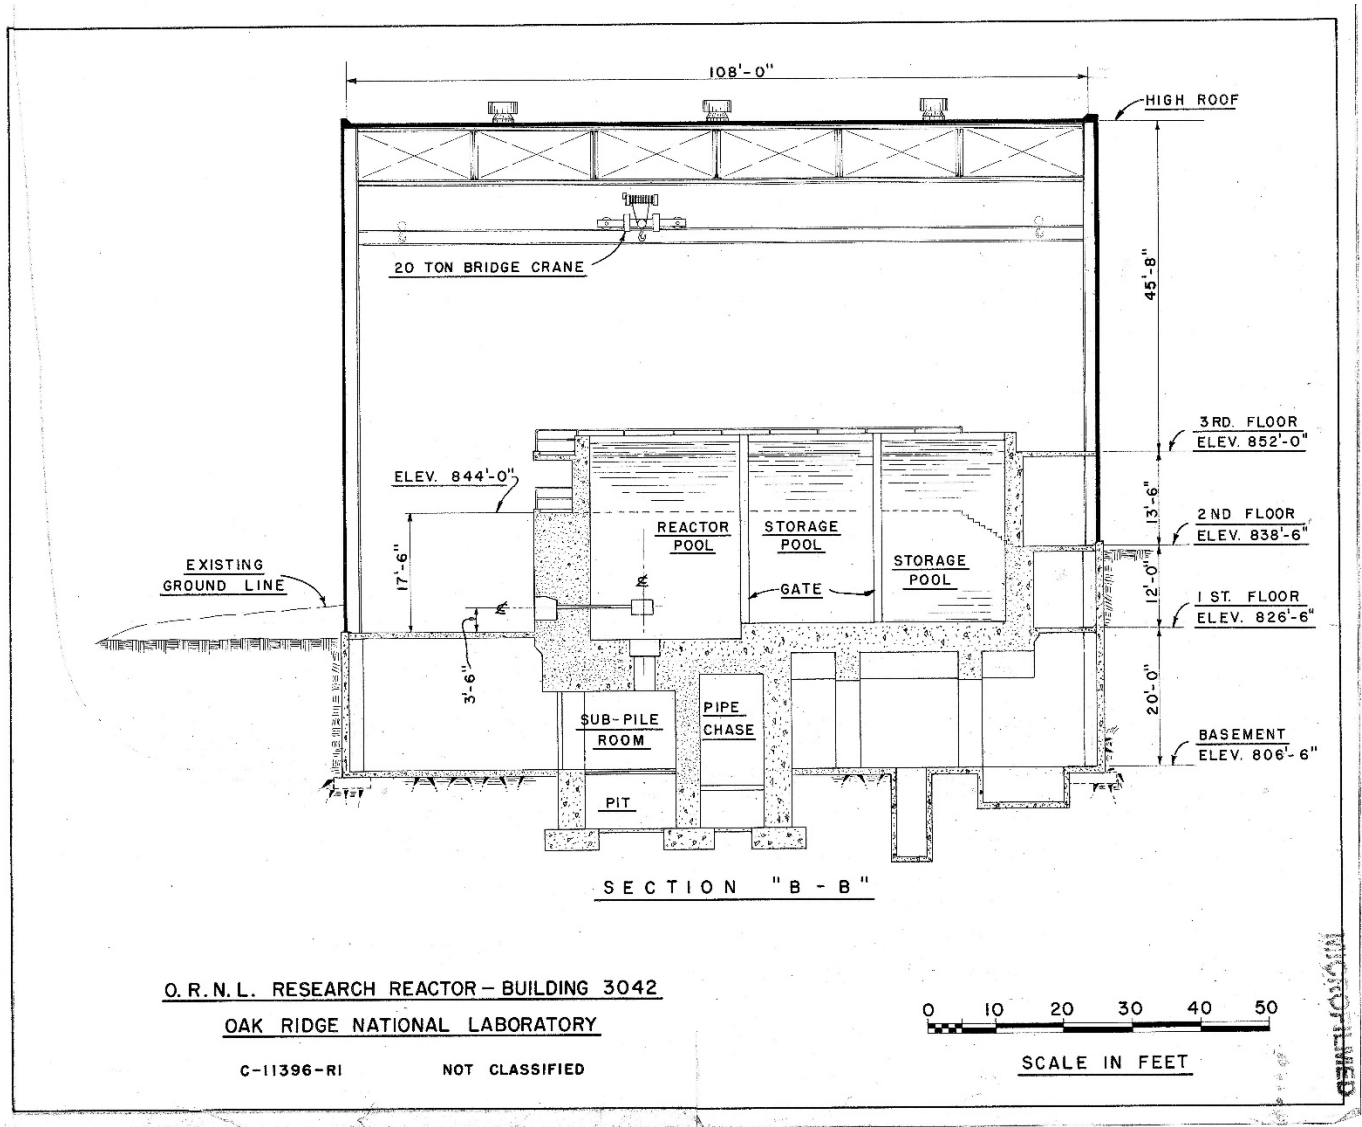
North to south vertical section of Building 3042 including the Oak Ridge Research Reactor structure (Oak Ridge National Laboratory, n.d.).
